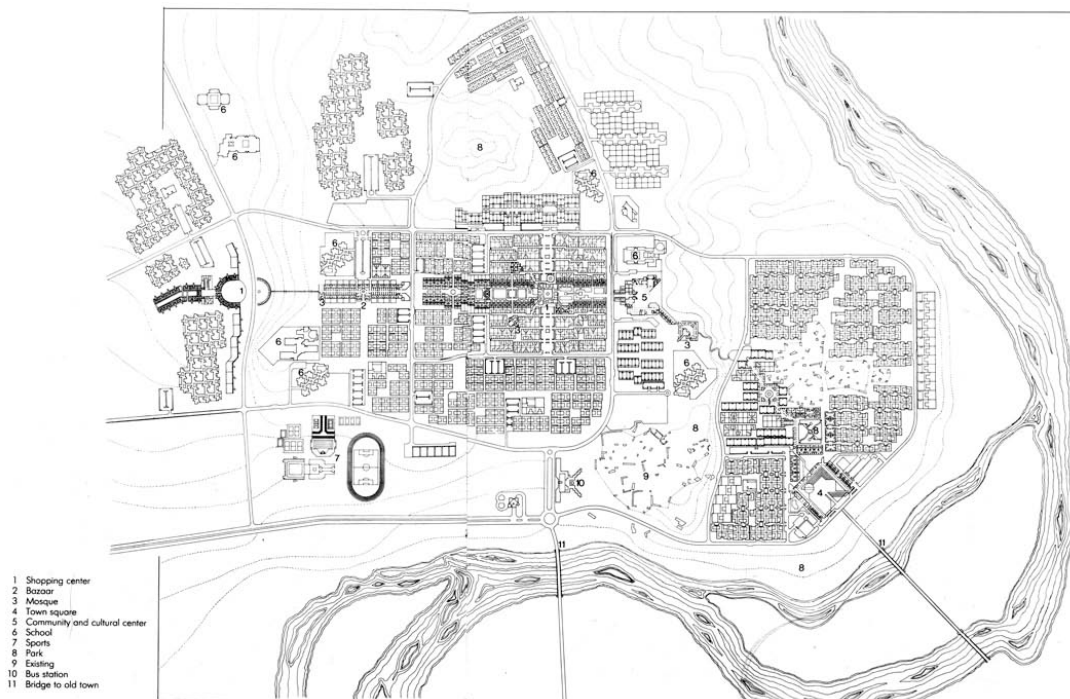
Mater plan of Shushtar New Town city by Kamran Diba Architects (source: Diba 1981)
